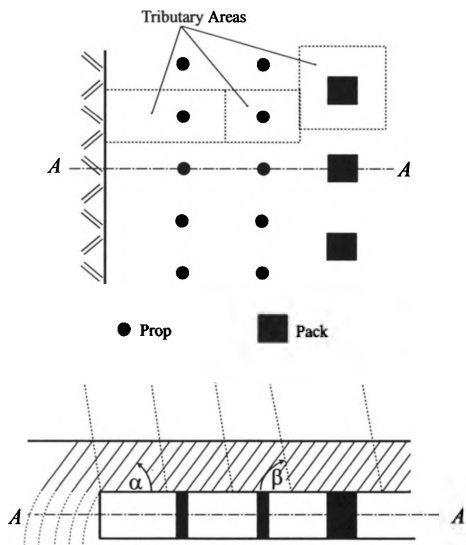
a): Plan view applied for tributary area load requirements (top), and b) face perpendicular cross-section used to determine maximum stable hangingwall spans in strike direction (bottom).
